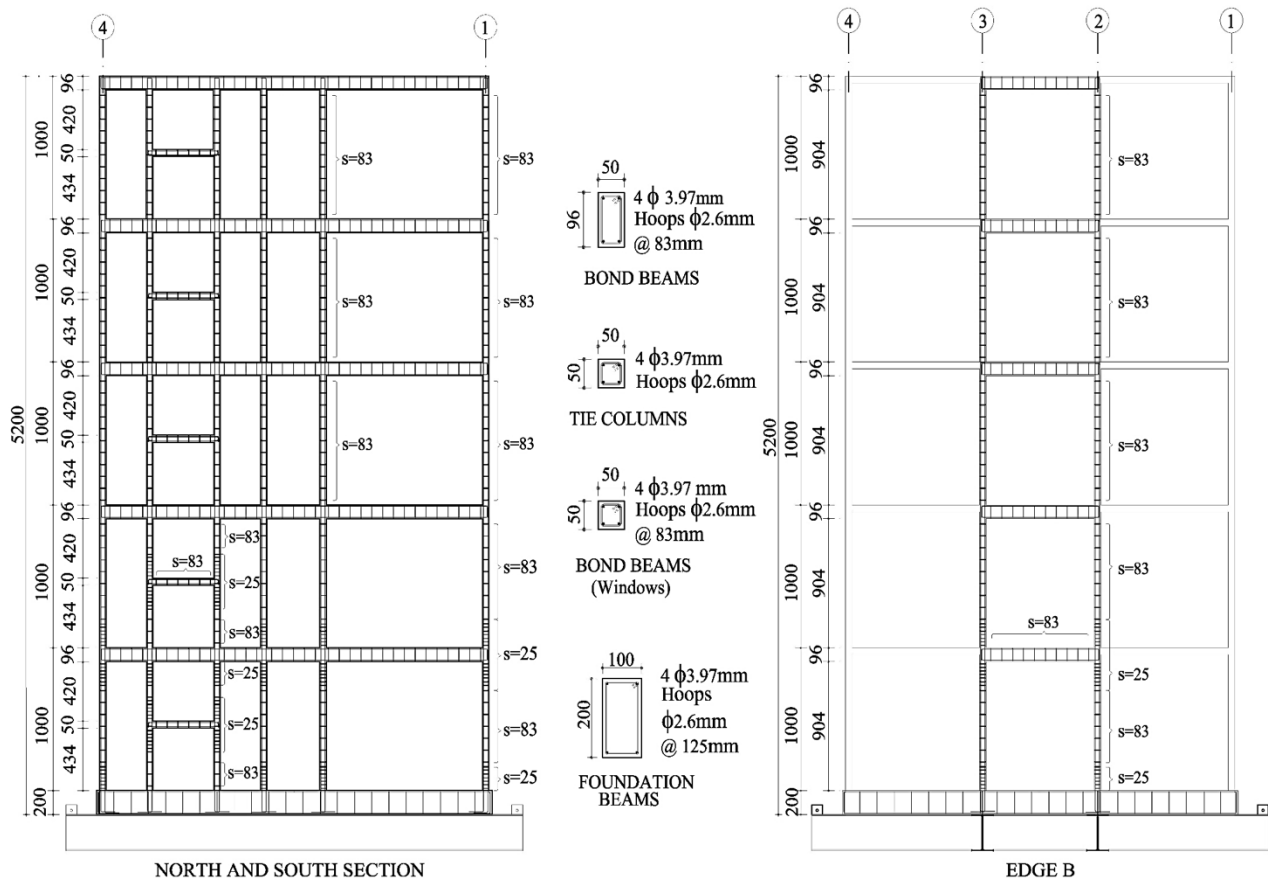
Reinforcement layout for specimen M5 (units in mm)
